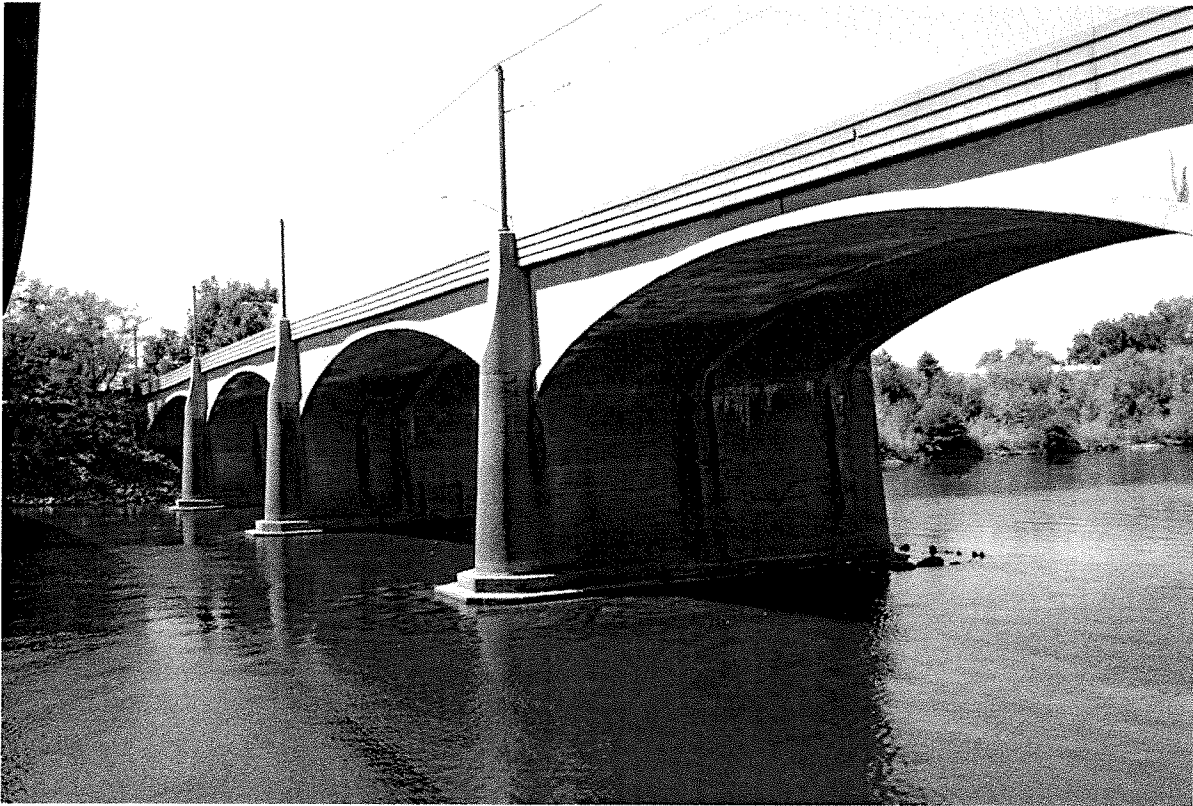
2 – View of the 12th Street Bridge on state route 160 across the American River from the east side. This view is looking south-west. The south bank, where the federal levee is located, has existing rock slope protection.
